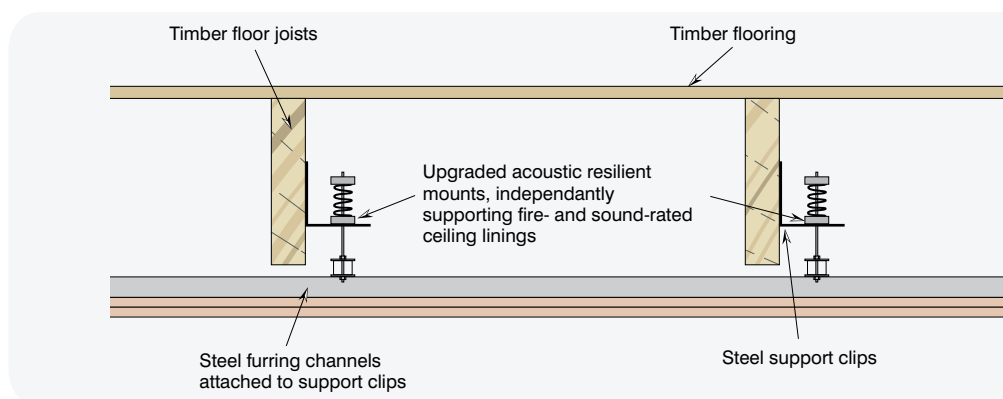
Upgraded sound-resilient ceiling mounts – elevation view.
